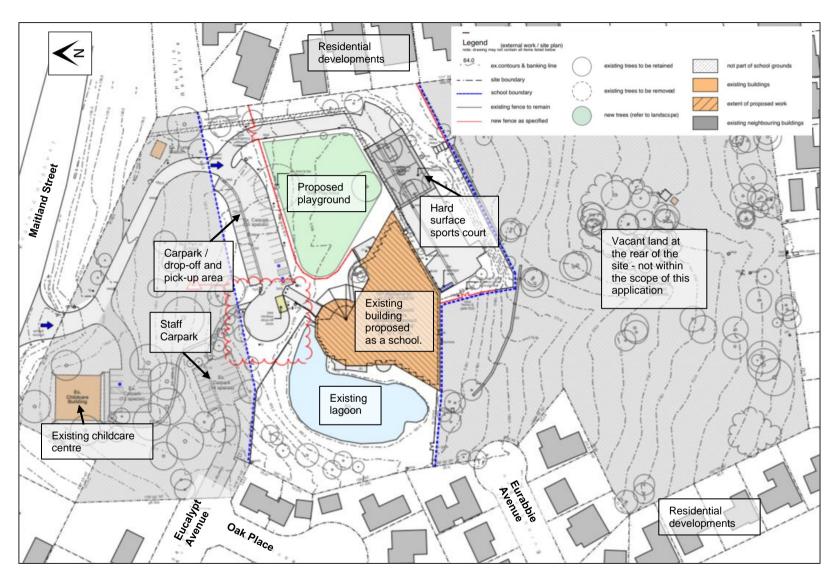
| Proposed external site layout (Source: Applicant's EIS)
